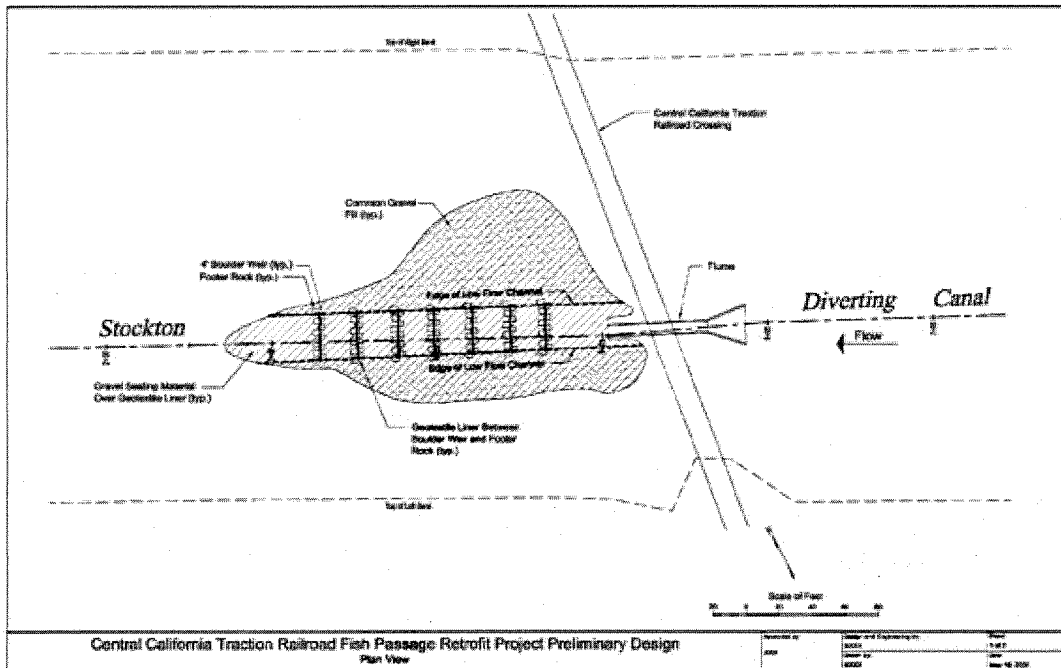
Central California Traction Railroad retrofit project preliminary design: plan view. Source: CDWR 2007. Subject to revision.
